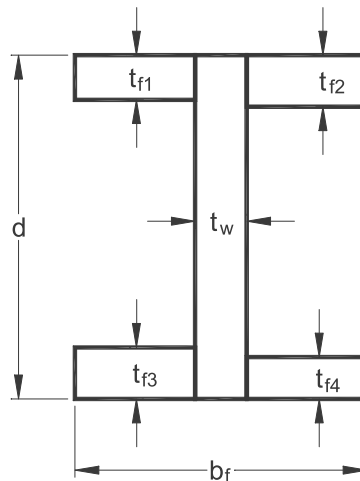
Illustration of the investigated geometrical dimensions by Jaquess [14]
